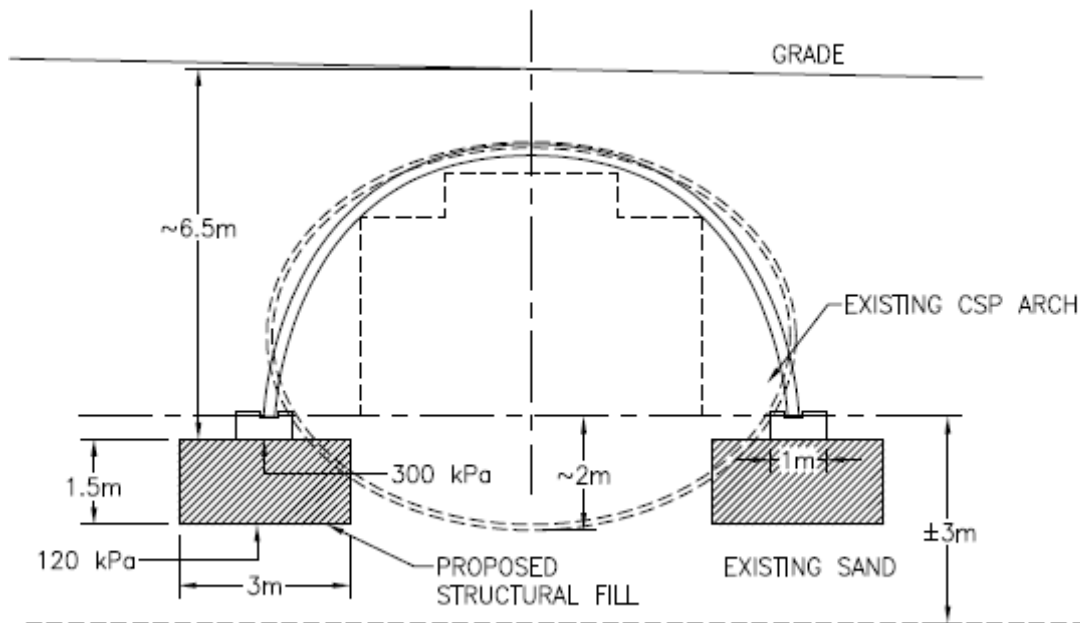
Revised Foundation Improvement Foot Print – Stage Two
